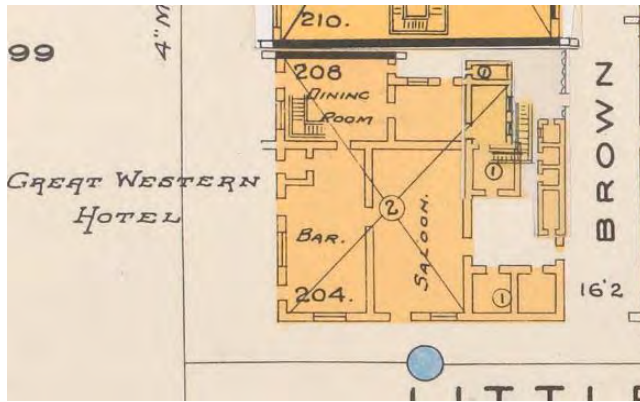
Extract from fire survey plan showing internal layout and reconfiguration. (Source: Mahlstedt Map section 1 no 19, 1948)
